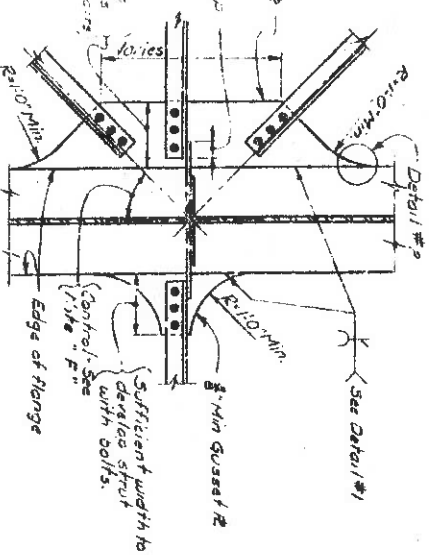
DETAIL SHOWING METHOD OF CONNECTING GUSSET PLATE AFTER STIFFENER AND/OR CONNECTION PLATE ATTACHMENT
